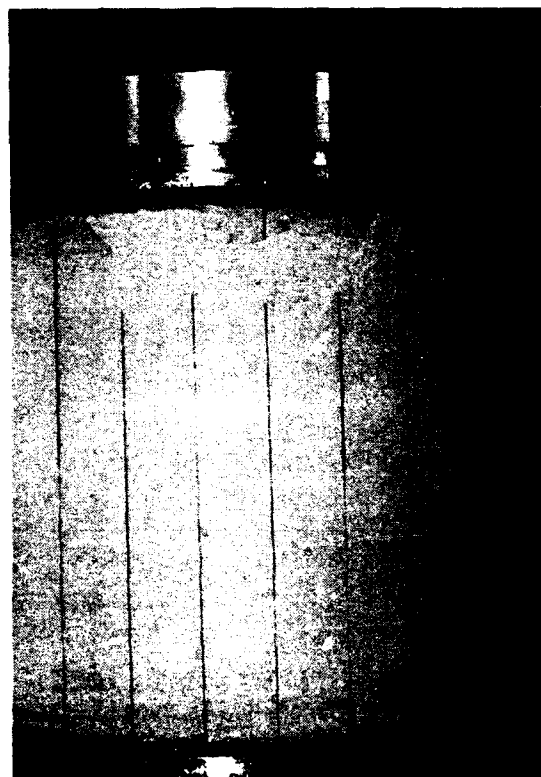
External spalling on cylinder C observed after 53 pressure cycles to 9,000 psi.
